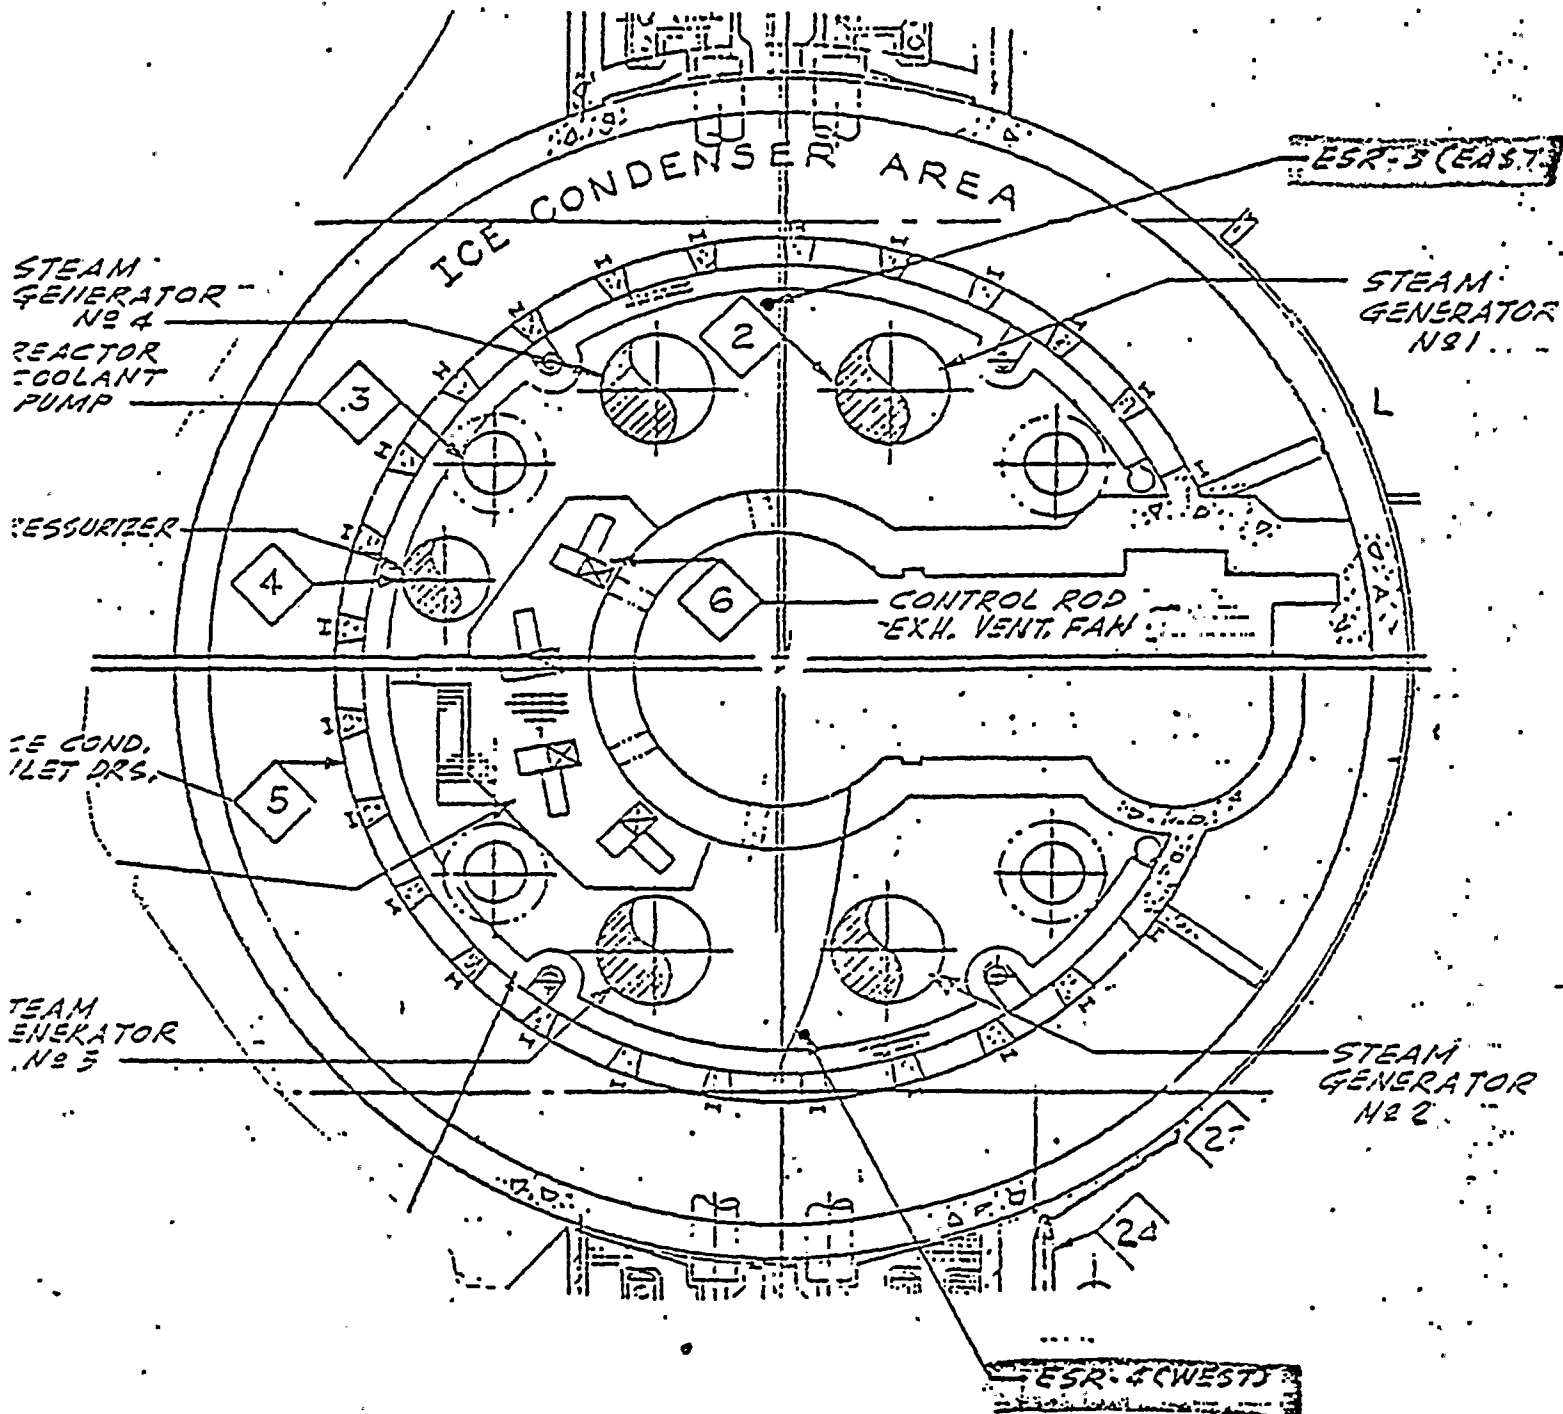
PLAN ELEVATION OF CONTAINMENT
